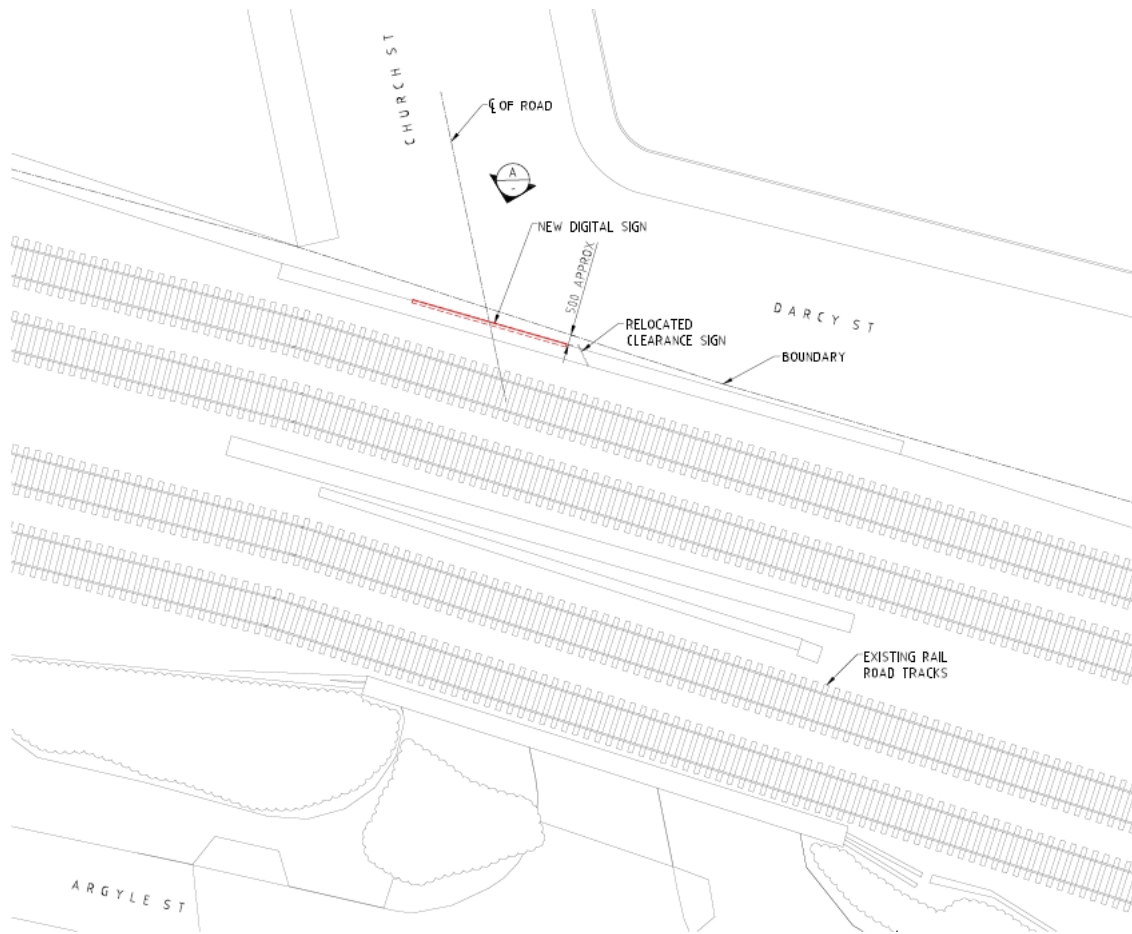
Proposed site plan (Source: Dennis Blunt Consulting Engineers)
